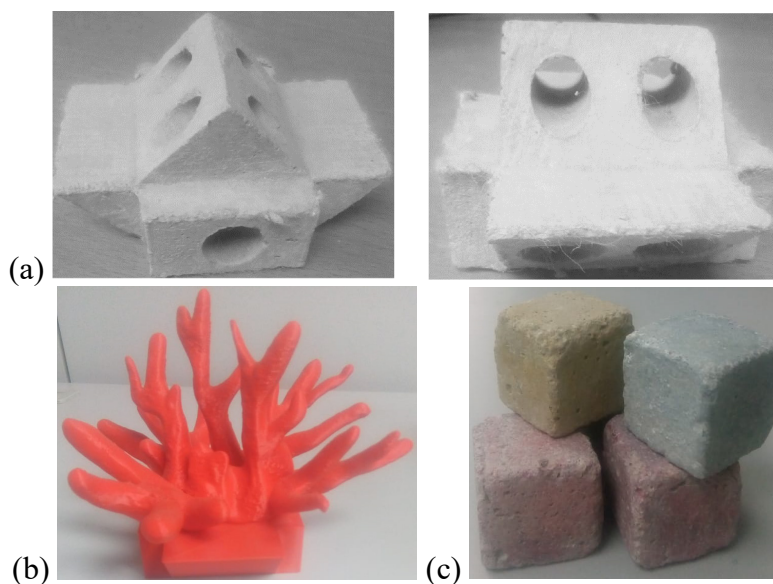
Breakwater armor units: (a) Trapezoidal modular block; (b) coral shaped reef; (c) concrete cube unit.
